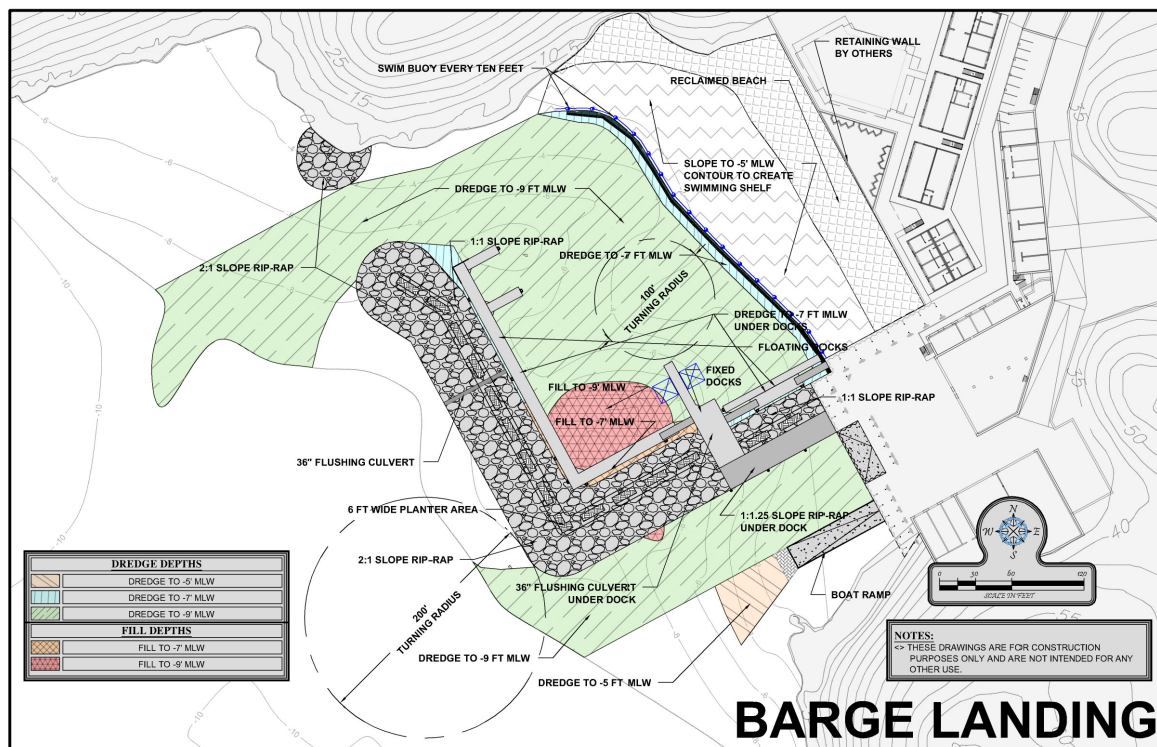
Barge Landing Site Plan (Exhibit 2)
